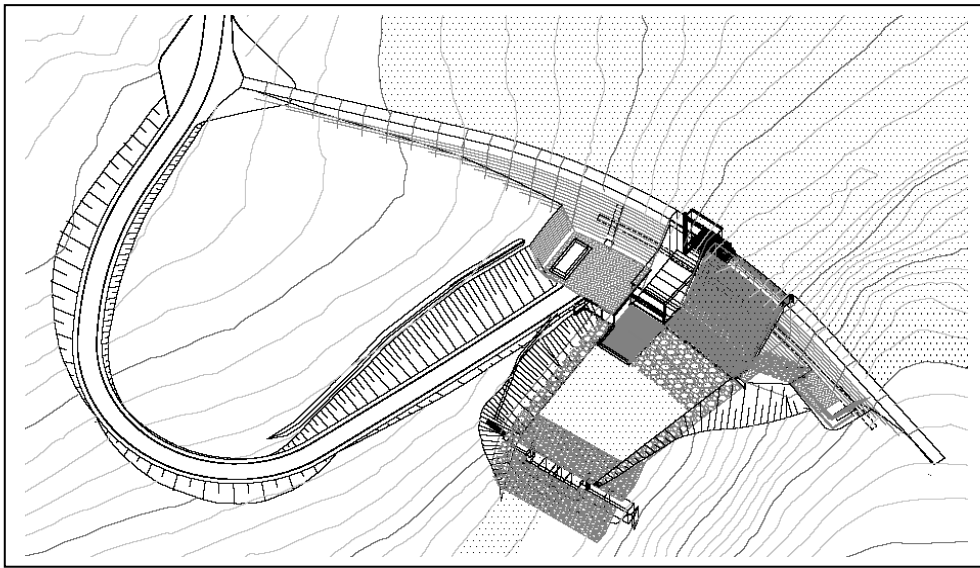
Isometric view of the Bramhoek Dam, Downstream Weir and Access Road
